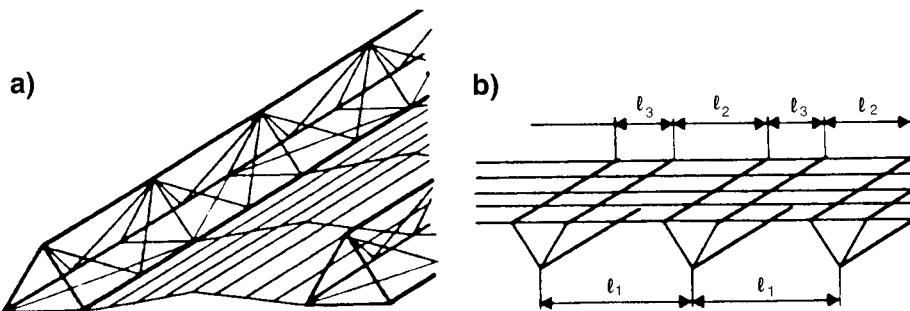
Triangular girders with apex pointing a) upwards b) downwards
